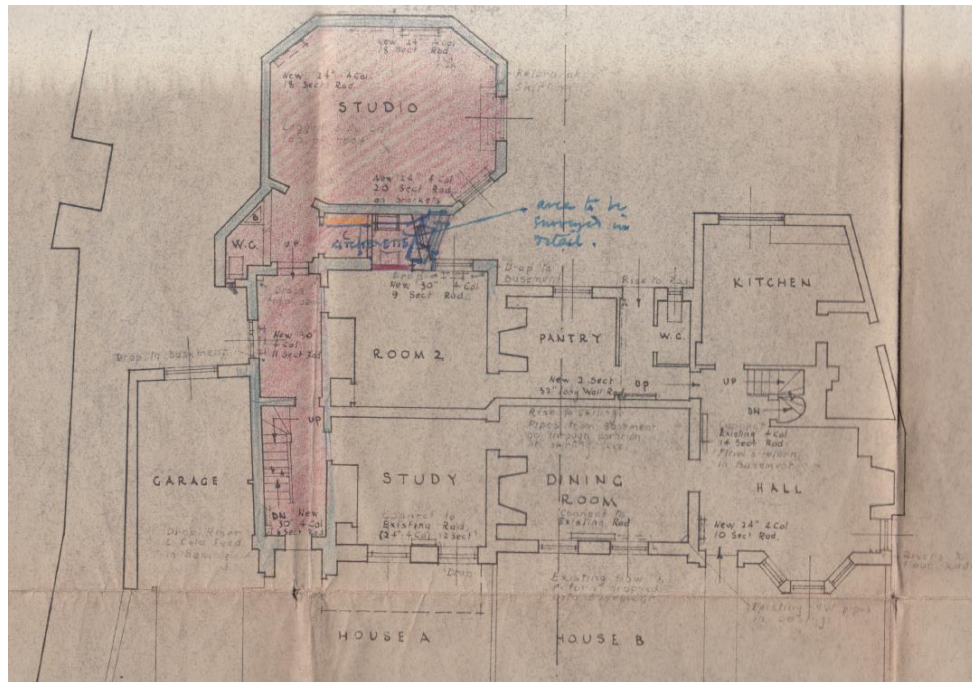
1946 ground floor plan (note the two parts of the property are referred to as House A and House B)
